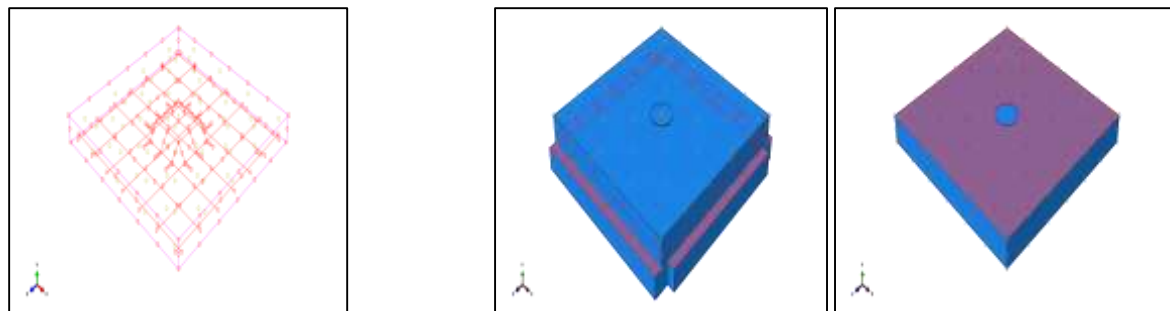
Interaction type reinforcement bar with concrete, circular plate with concrete, rigid steel support with concrete.
